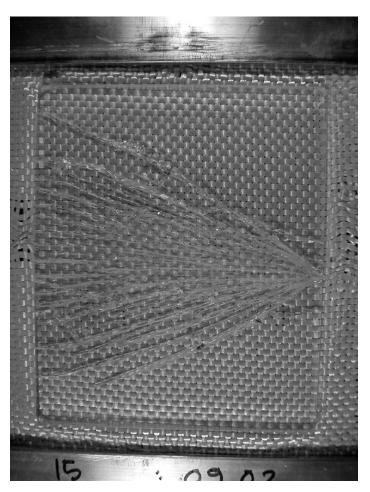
Specimen 15, side 2: Aramid textile/PVB interlayer Fracture pattern after failure
